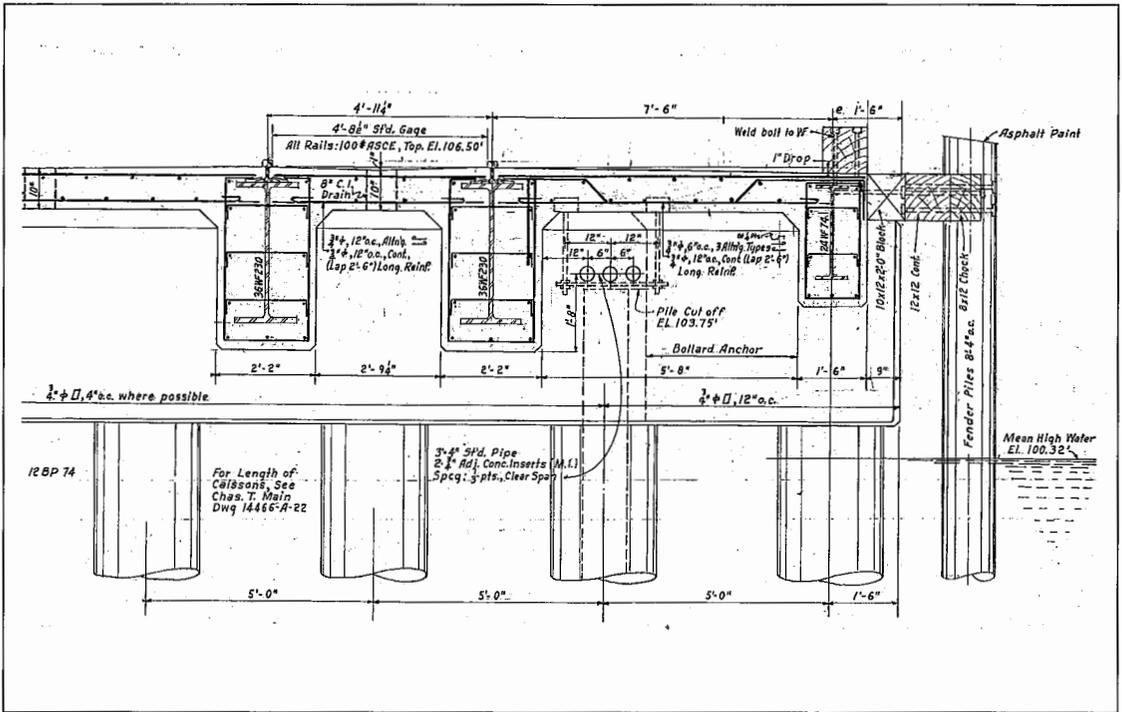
Partial section of Fitting Out Pier 2 from a 1942 archive design drawing.
